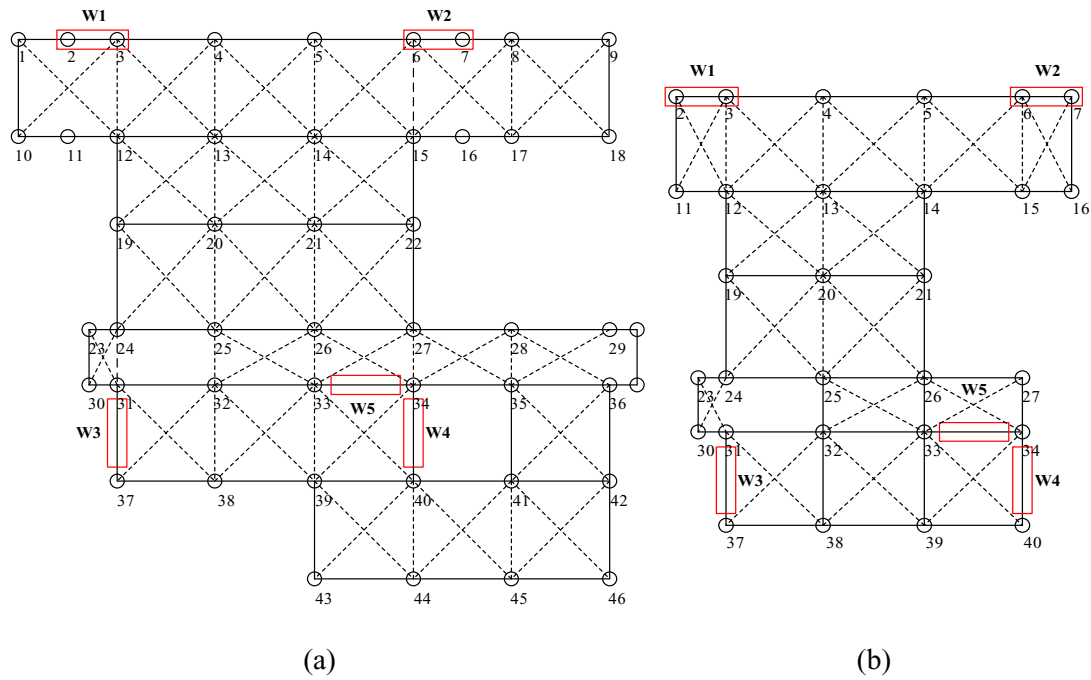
Plan view of the RC wall's locations for: (a) 1st and 2nd; (b) 3rd and 4th floors in the building
